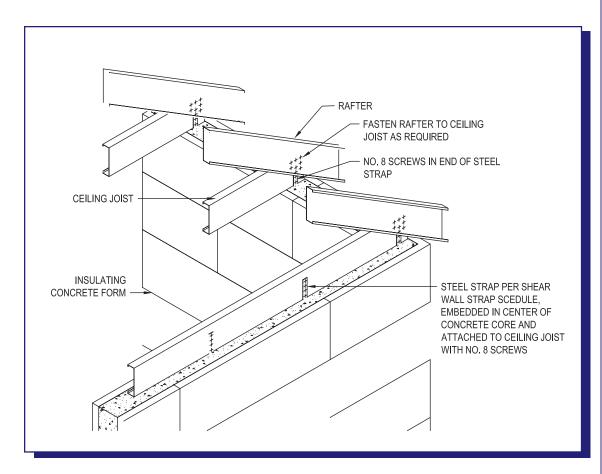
Steel Strap Connection Method at End Roof Joist to Wall Perpendicular to Ridge
